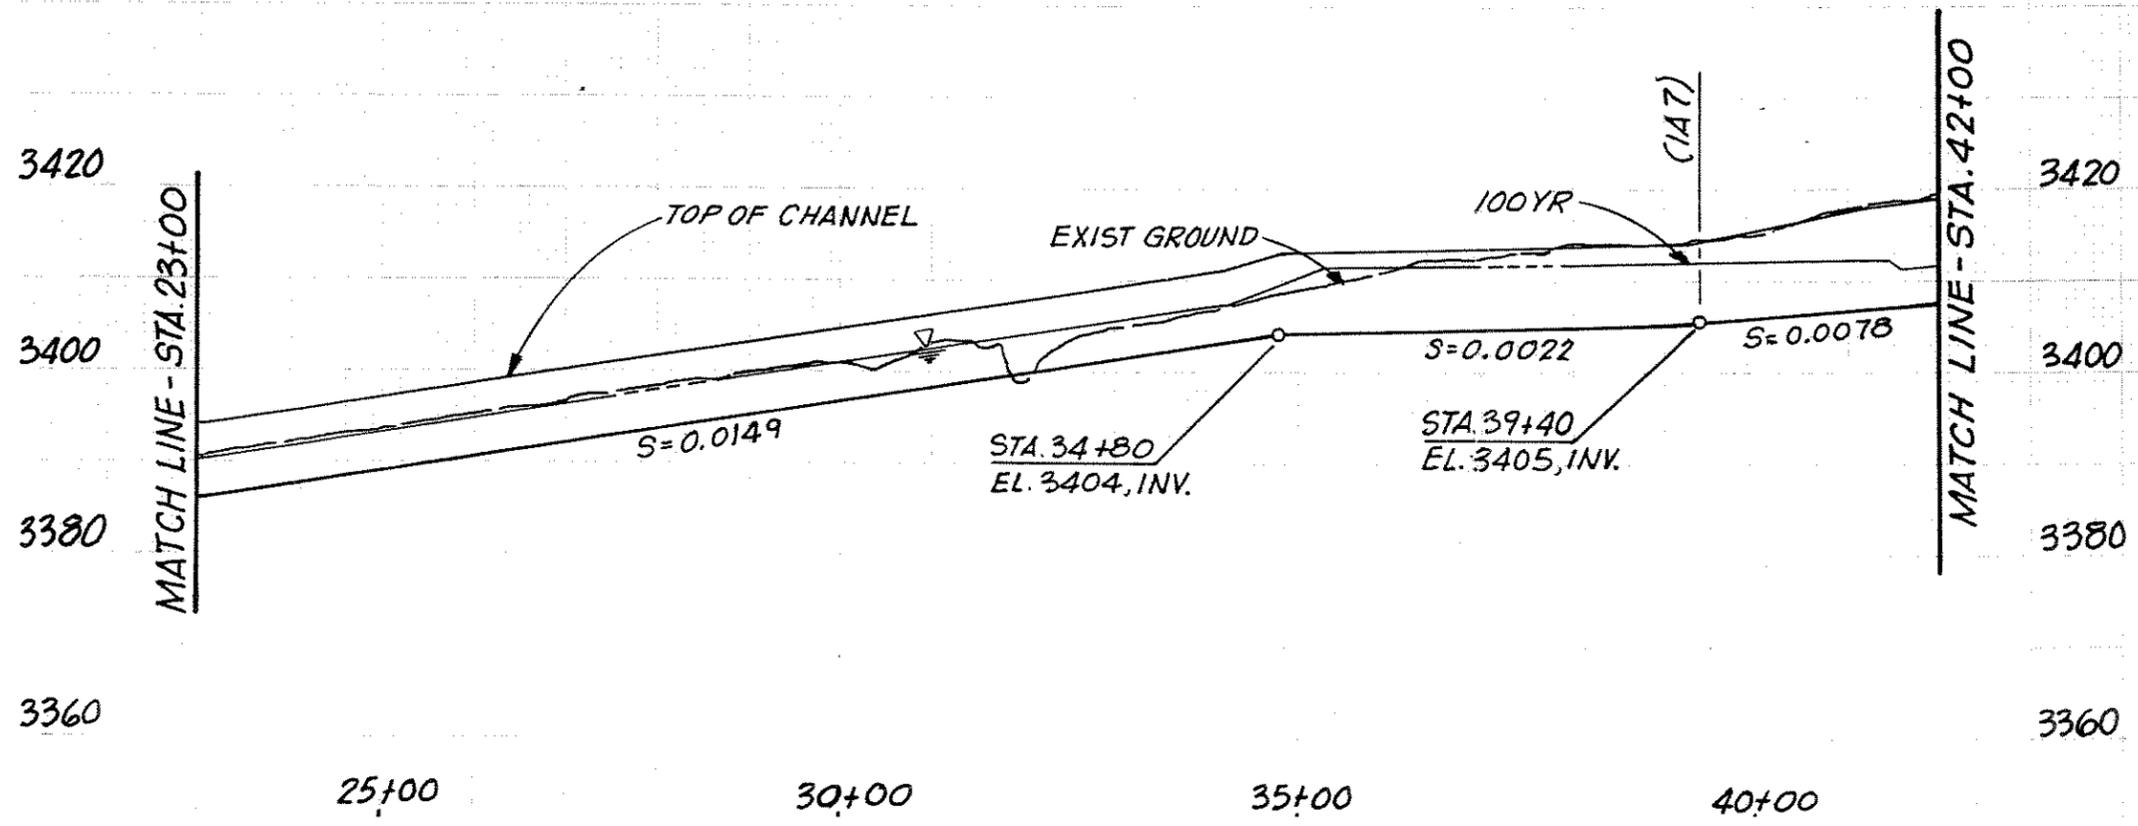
PLAN & PROFILE BULL MOUNTAIN BASIN DRAINAGE REPORT KINGMAN AREA MASTER DRAINAGE STUDY
